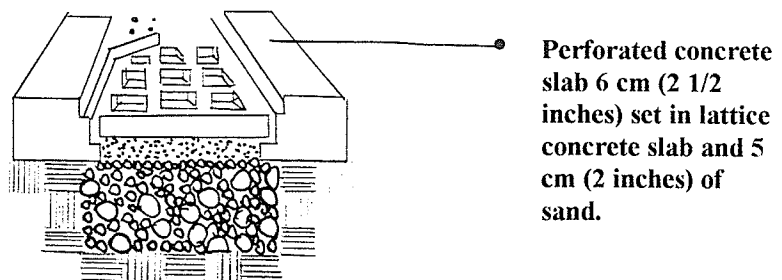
details the use of granite, brick or concrete blocks as a porous pavement. Figure 2.19 details modular paving useful for grass swales. Required maintenance may involve the blocks be lifted and the sand filter cleaned out.
